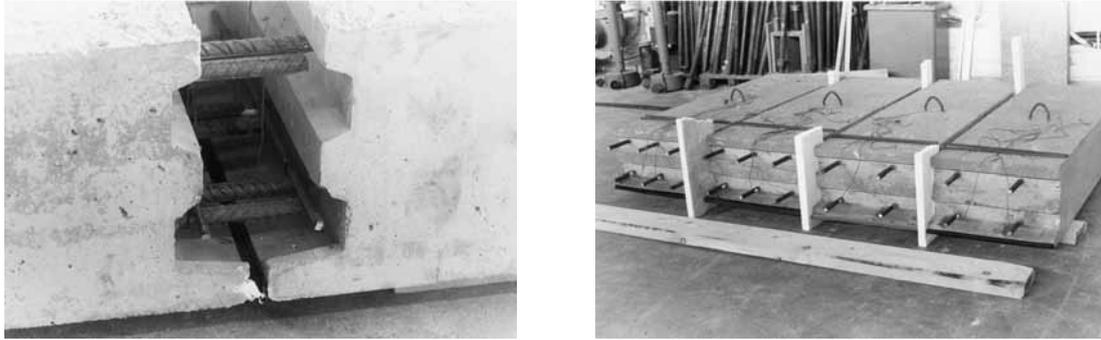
At left is the joint before casting, with the reinforcement to be spliced and the transverse bars on top. At the right are four halves of specimens before jointing.
